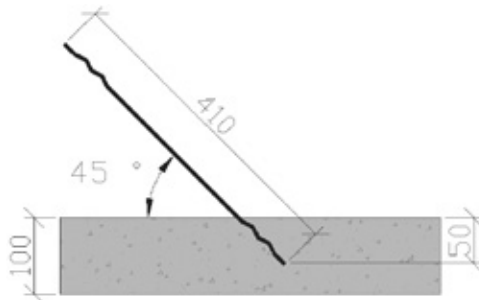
Test specimen of final tensile strength test on type D connection pins.
